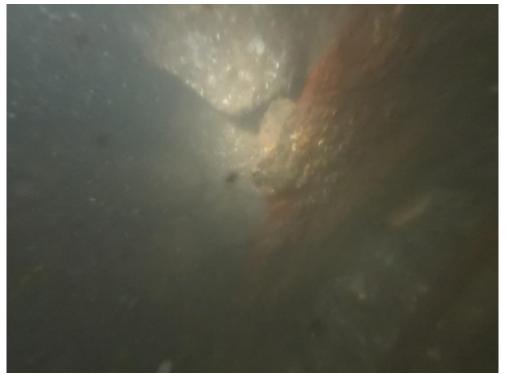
Loose flap of Steel following loss of pan face – Typical
